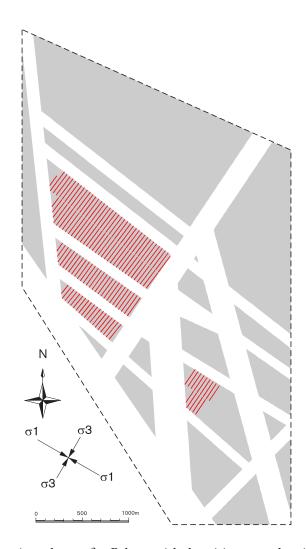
Repository layout for Beberg with deposition tunnels oriented perpendicular to the maximum horizontal stress; z = -600 m.
